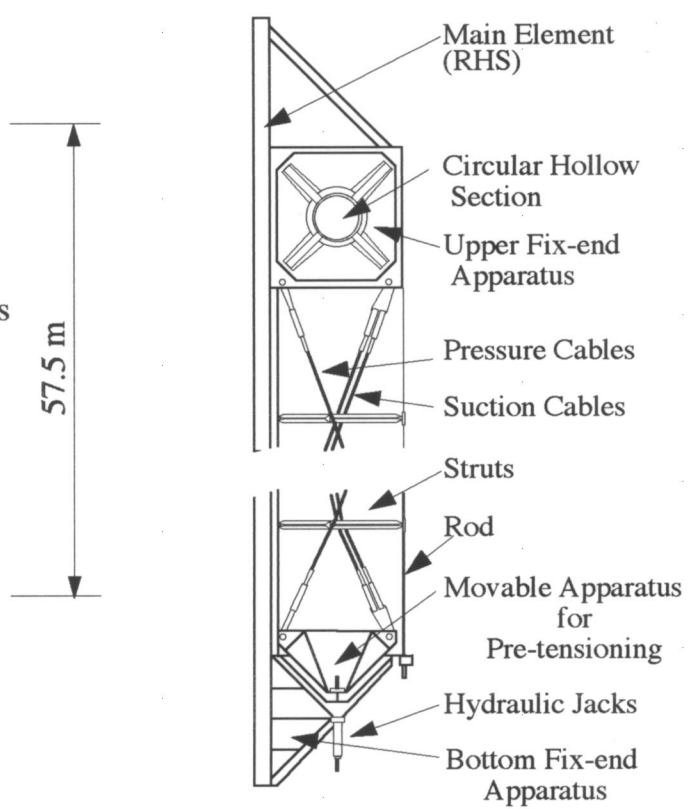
(a) shows the cross section of GLASS HALL. GLASS HALL has large-scale glass walls, of which sizes are 57.5 m and 25 m high. The tension structures, called the cable truss structures, not only support the glass walls but also prevent the roof structure rocking during earthquake, therefore high axial forces and transverse forces apply to the cable structures. High axial forces reduce cables' tension and thus they reduce stiffness of the whole structure.
